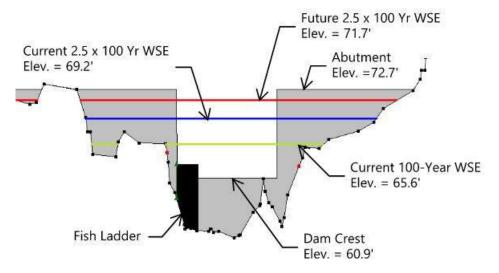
Alternative 1 - Raise Top of Dam Concept Cross Section
